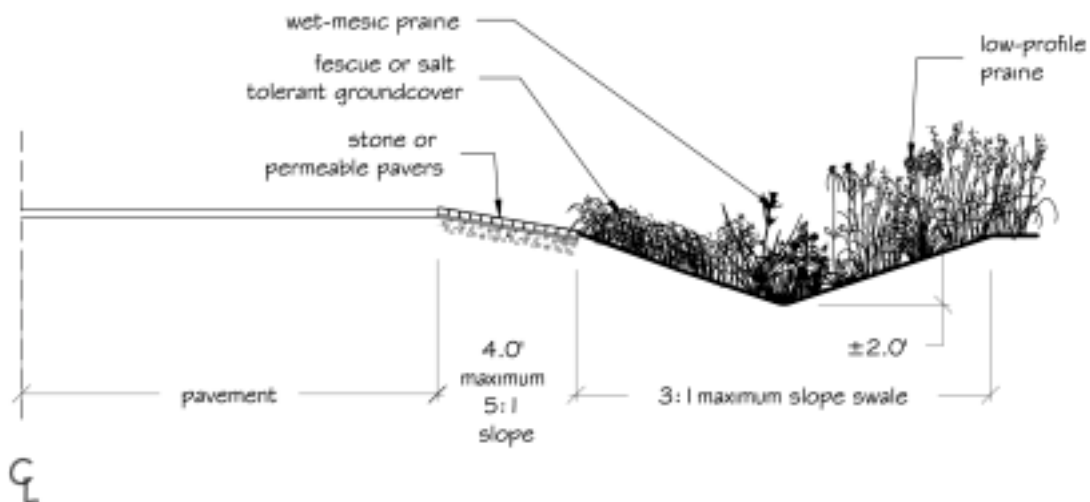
Typical cross-section for interior driveways without curb and gutter
